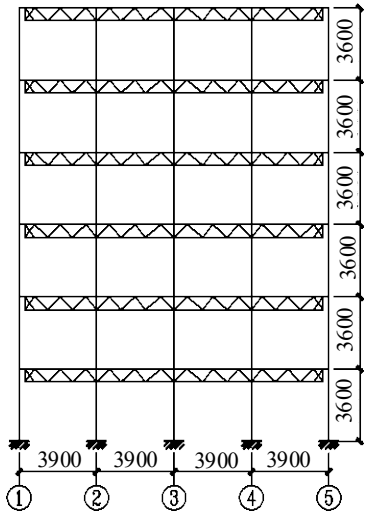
Structural elevation of the multi-column frame tube structure with ATBCF.
